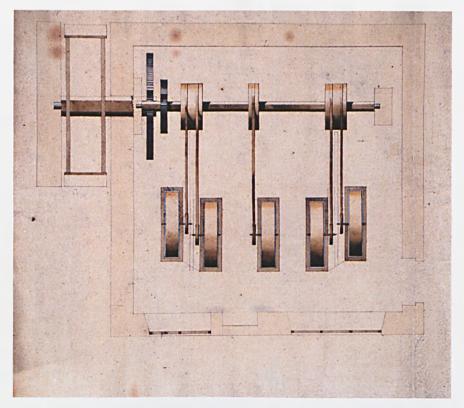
Plan of the same scheme, with arrangement of five heavy troughs facing the large windows at the front, door on the right and ubiquitous hearth in the centre (SCA).
